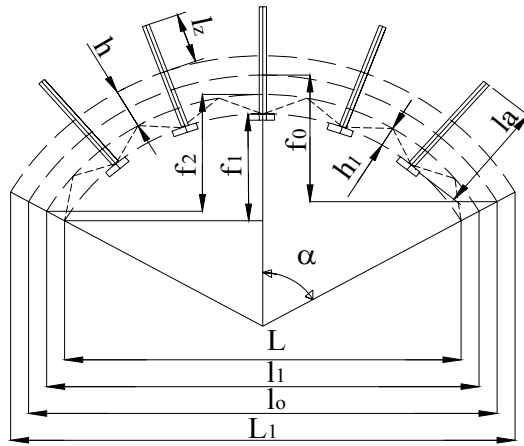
Sketch for beam creation in bolted arch shaped roof.
